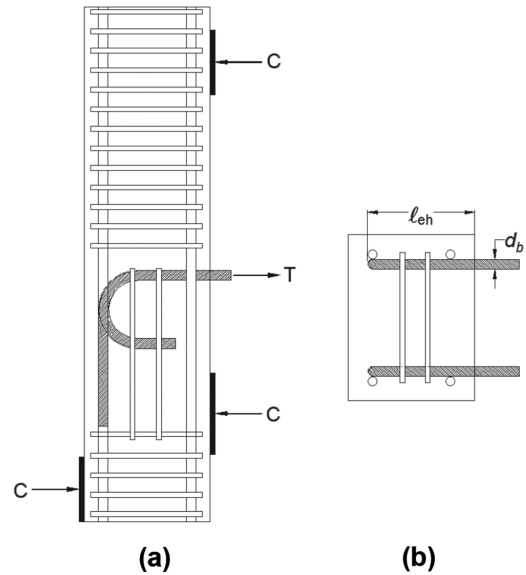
Specimen with confining reinforcement perpendicular to straight portion of hooked bar: (a) side view; and (b) cross section (Sperry et al. 2017a).
